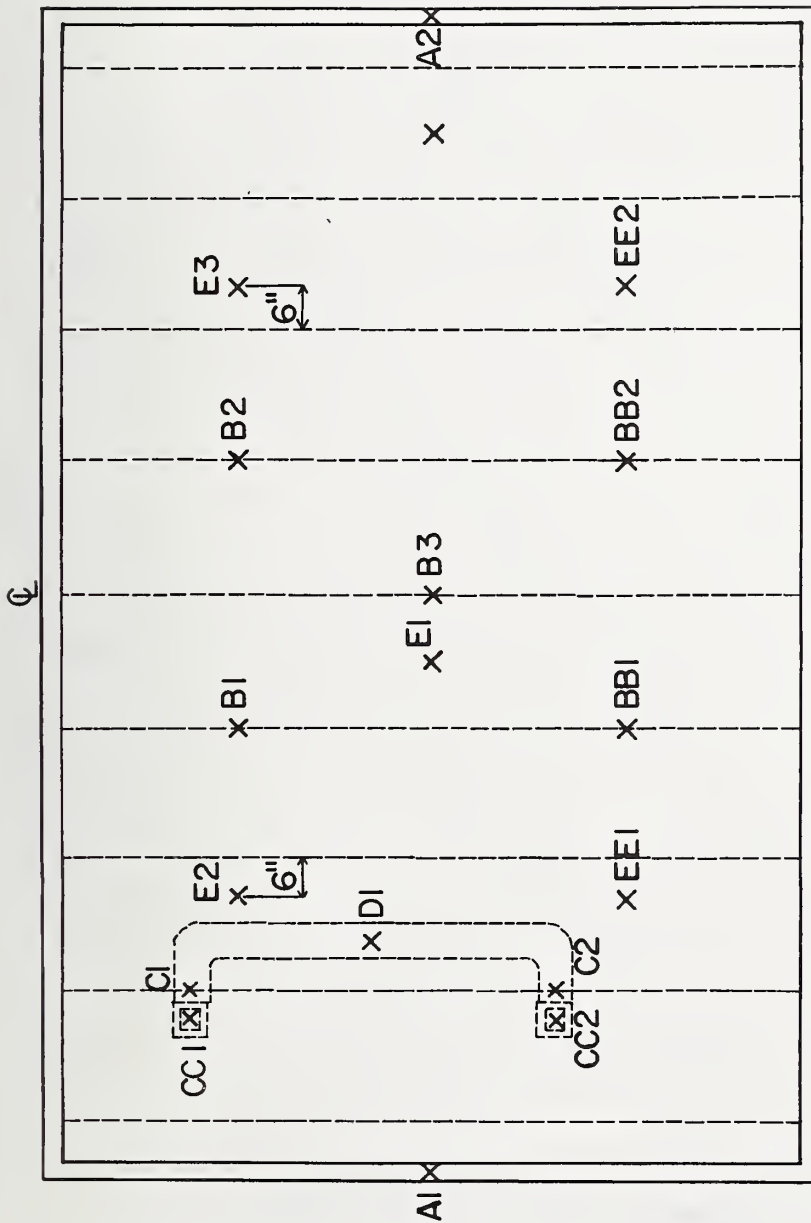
FLOOR OVER FOUNDATION SPACE: THERMOCOUPLE LOCATIONS ON UNEXPOSED SURFACE
